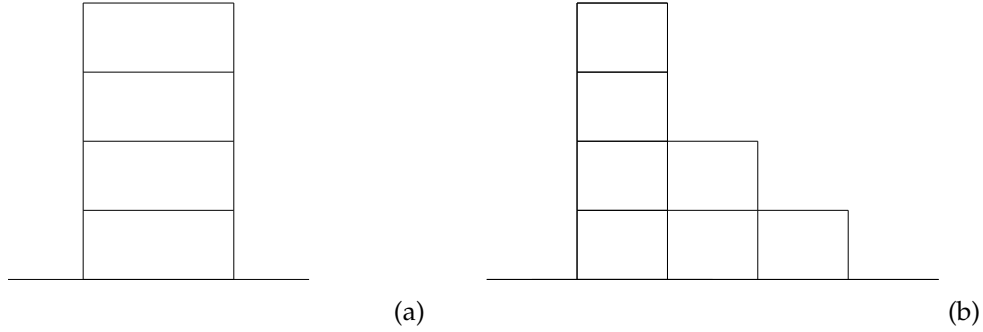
Sketches of the building types we are considering: (a) “normal” 4-storey building and (b) “L-shaped” 4-storey building.
